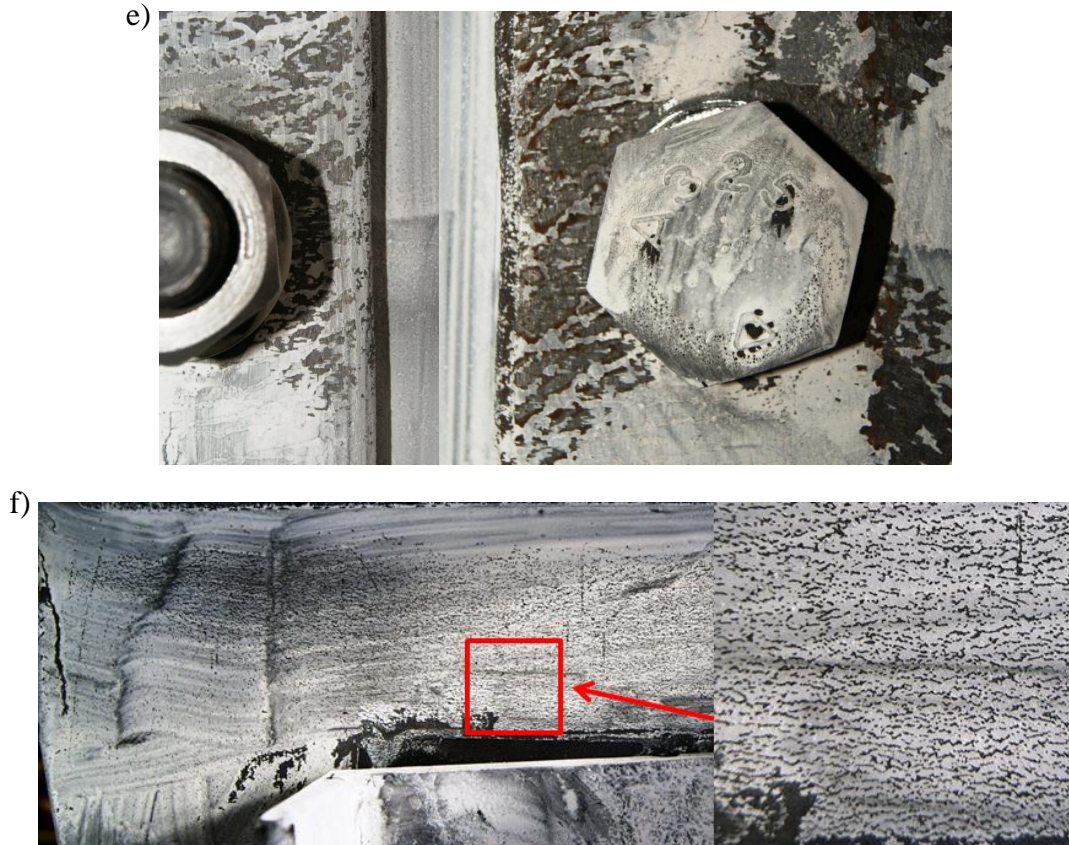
Specimen No. 2 - Observed damage after the test: a) net section rupture at connection; b) fracture plane; c) necking on short leg; d) cracks near bolt hole; e) necking at net section in the bottom connection; f) yielding of the gusset plate (continued)
